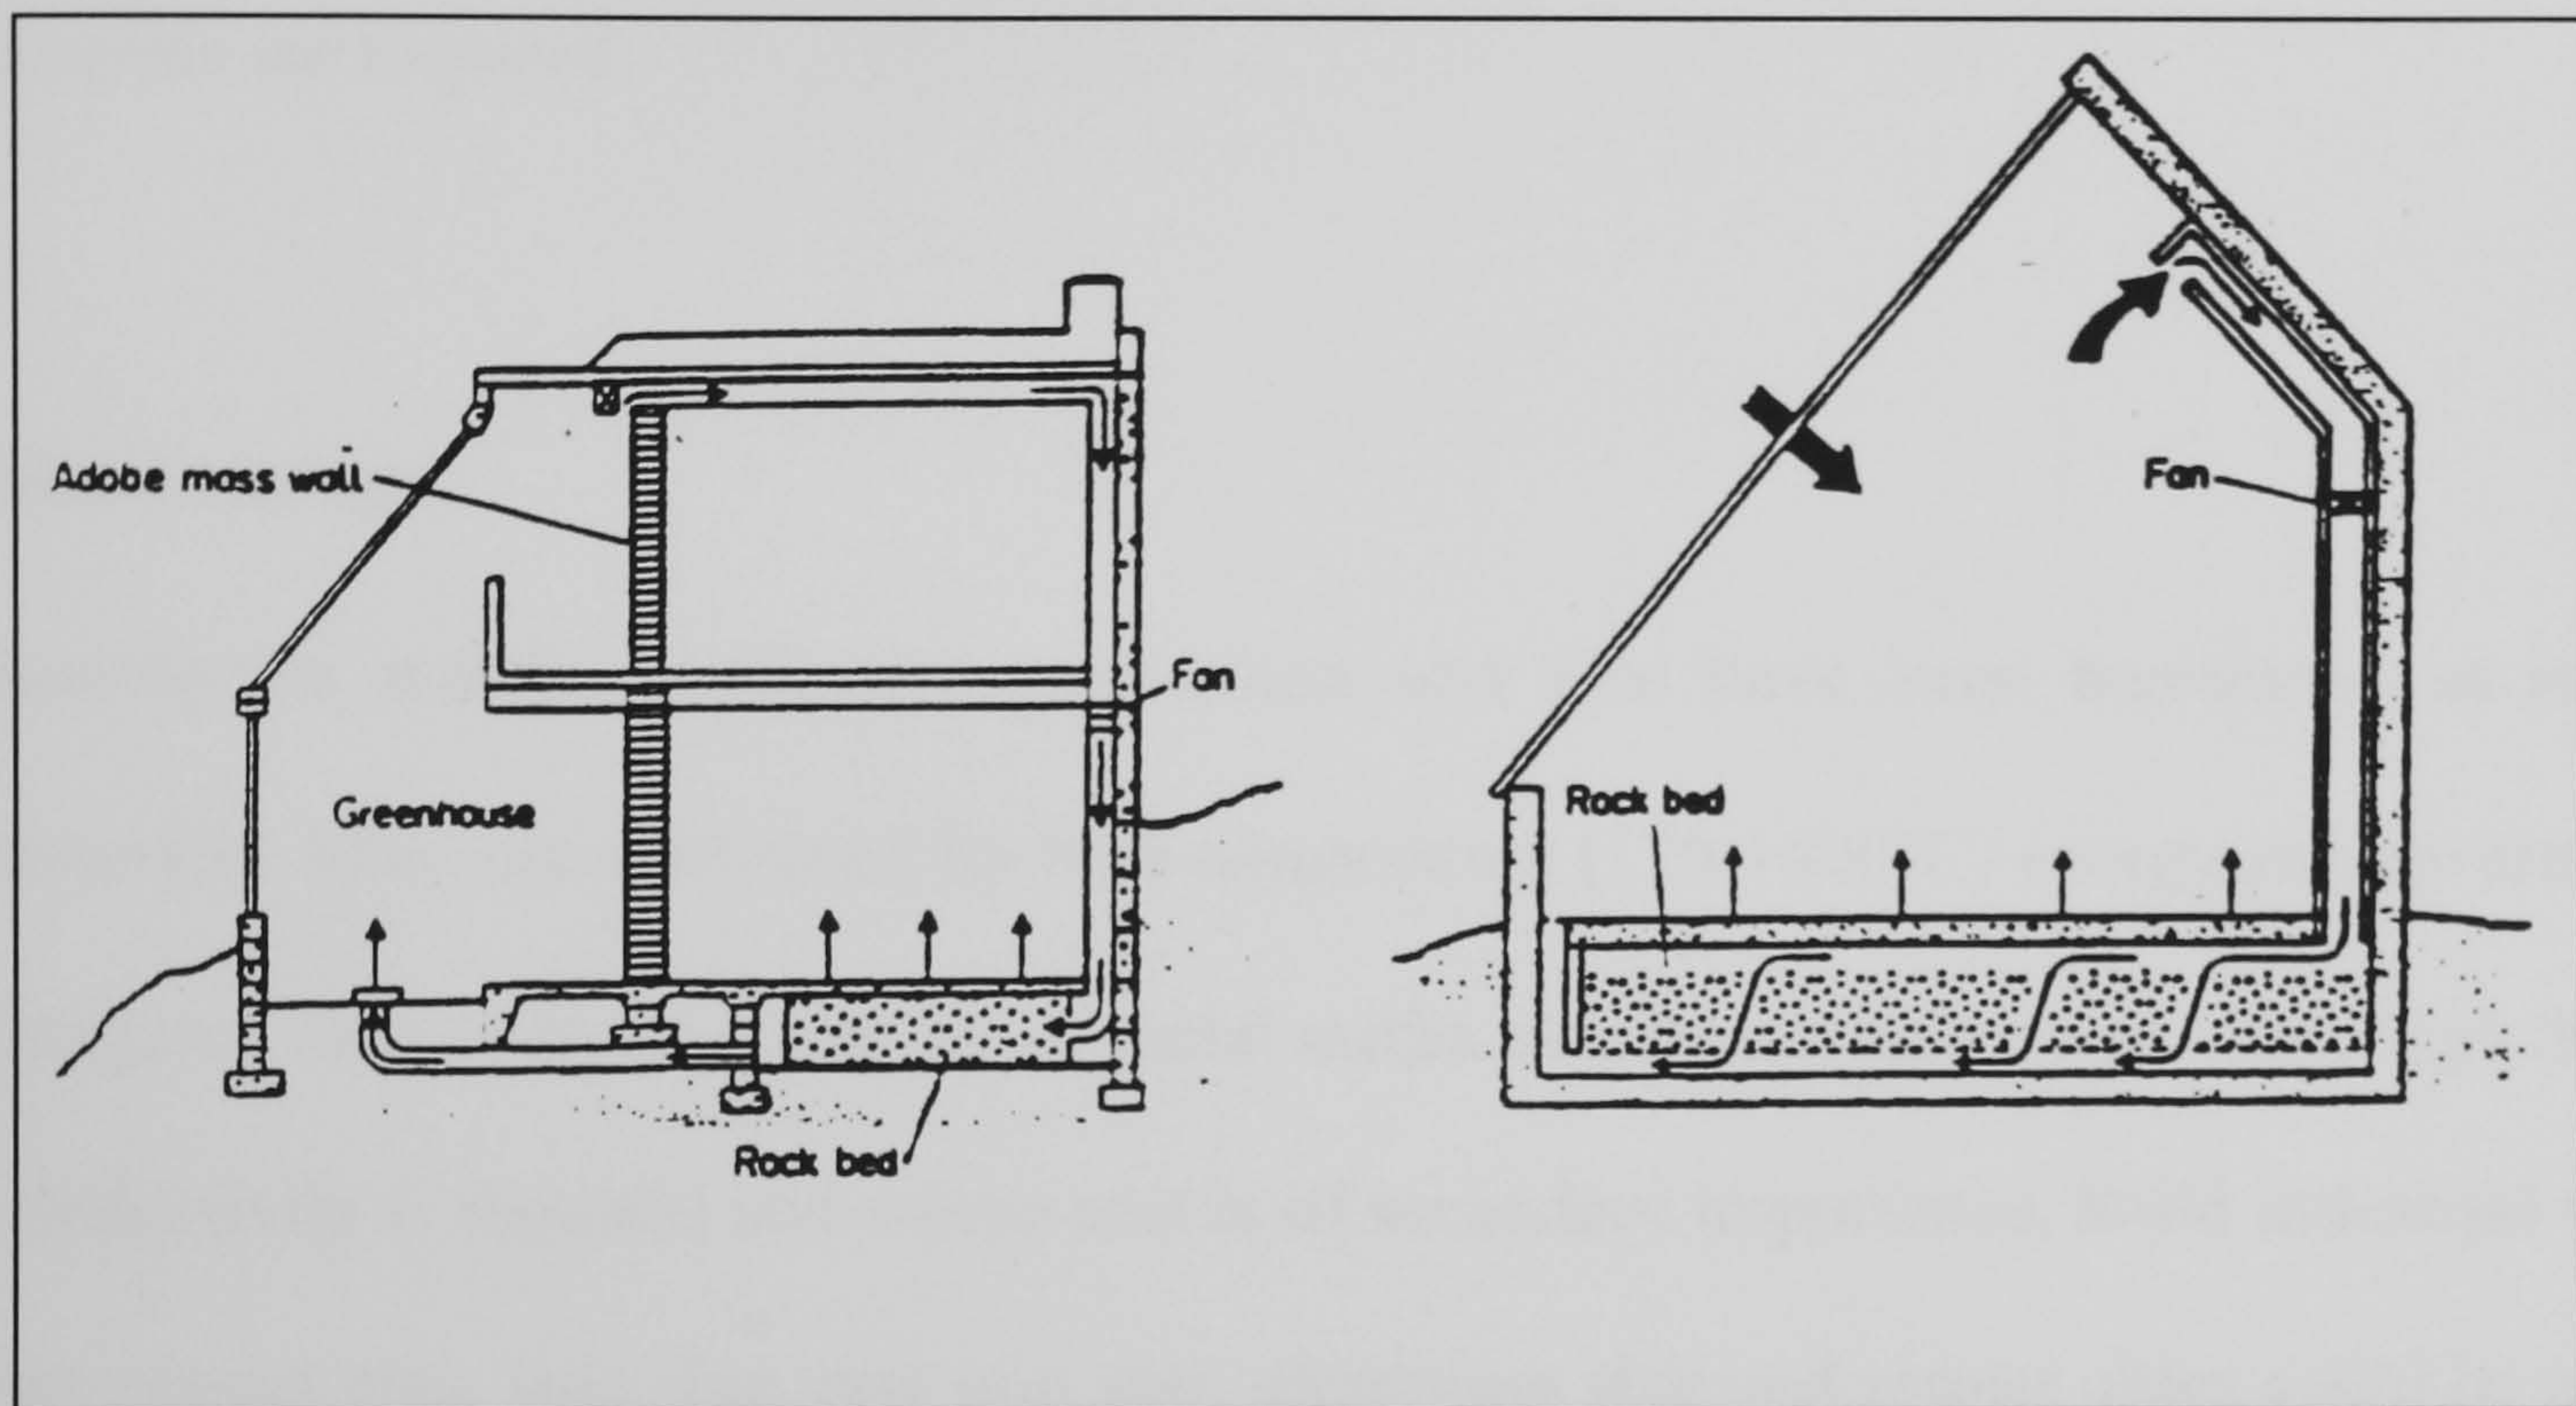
Cross section of the solar house with a shallow rock bed, (Clark,1982).
